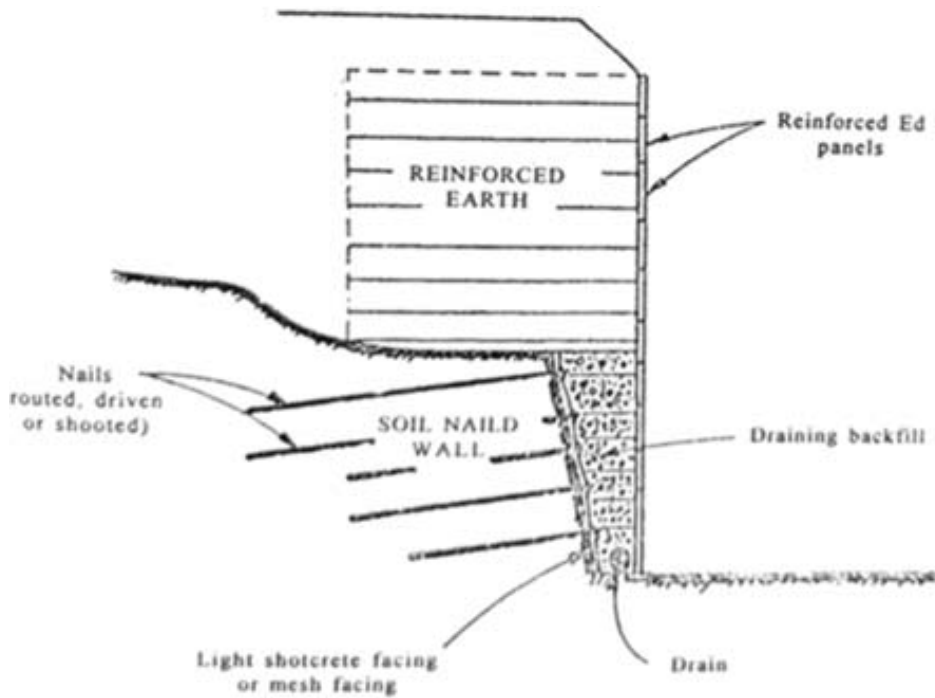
E: Combination of Reinforced Earth and Soil Nailing
